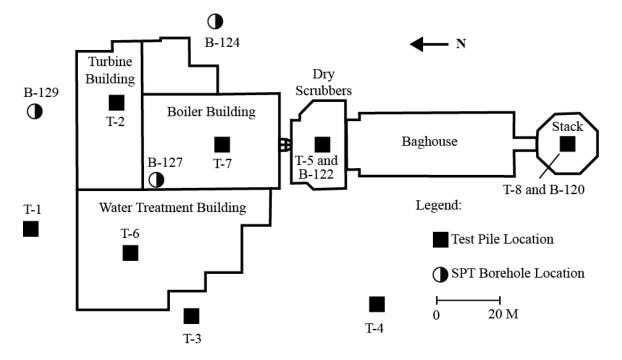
Layout of power block area structures showing locations of borehole and probe pile clusters.
